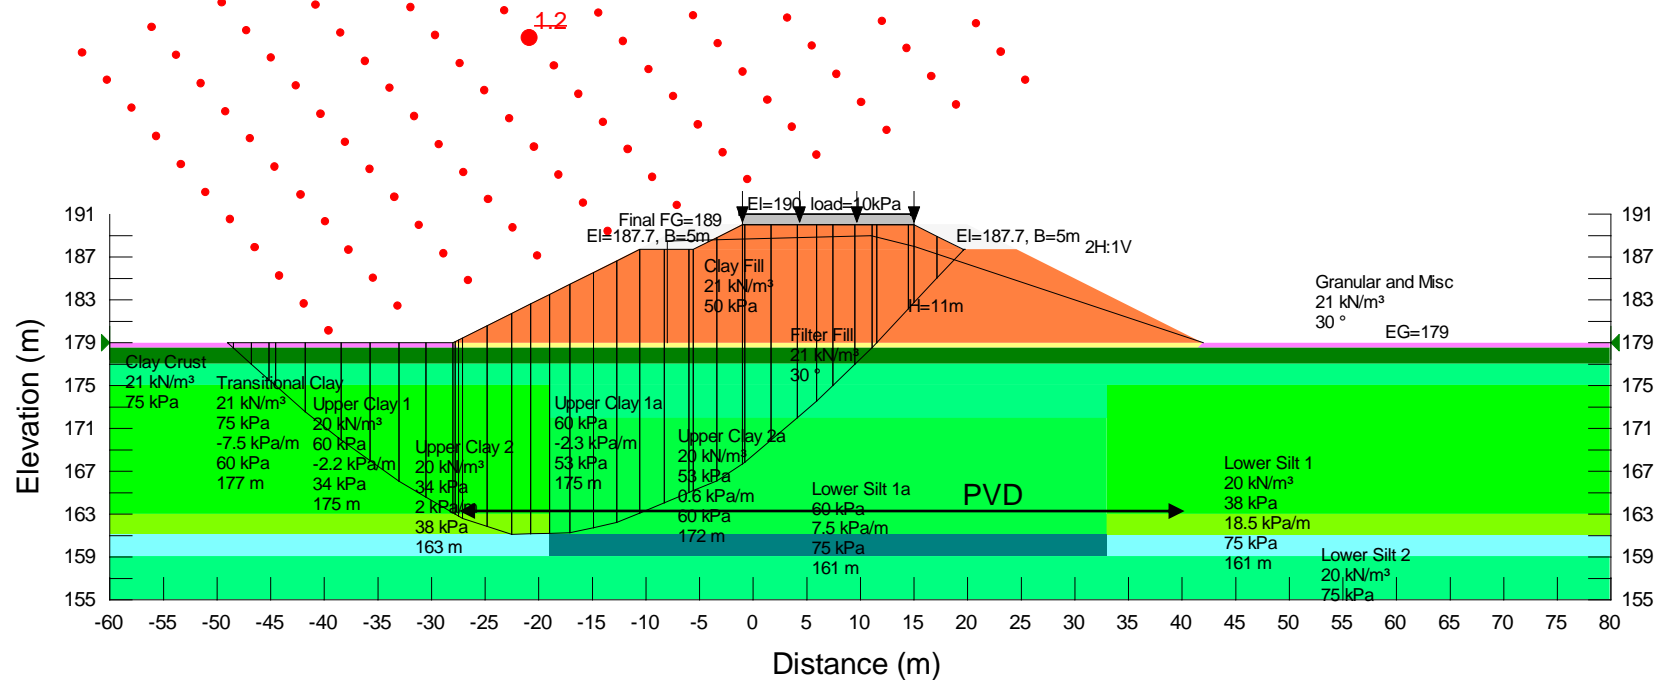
Slope Stability Result - Section 3 (Sta. 11+075E) - Stage 3 (Final Config) - Short-term Loading
